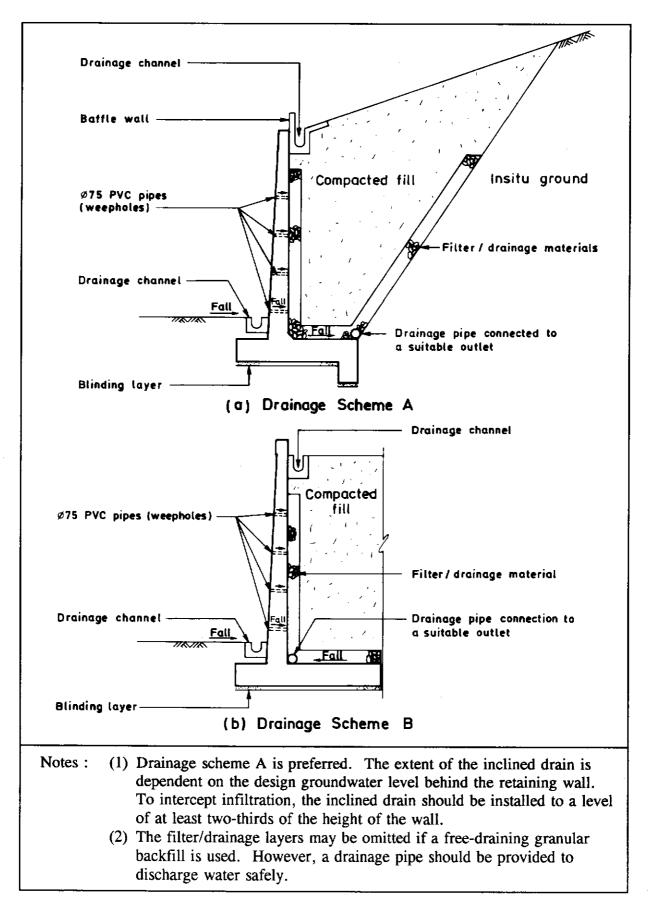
Examples of Use of Filters and Drainage Layers in Retaining Walls
